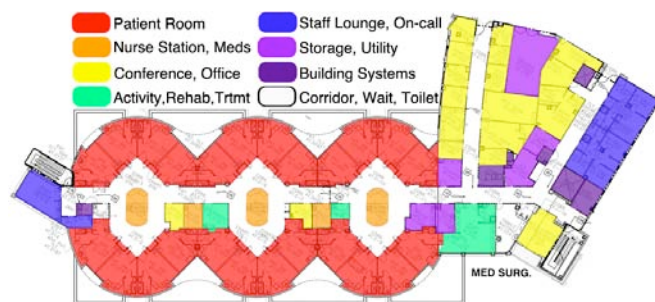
Floor plan: General layout configuration of upper level wing addition with regular patient rooms on left and core areas on right.
